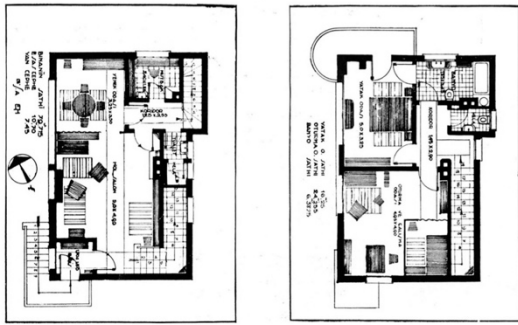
Ground floor and first floor plans, student: Edip Hikmet, (Anon, 1931)
